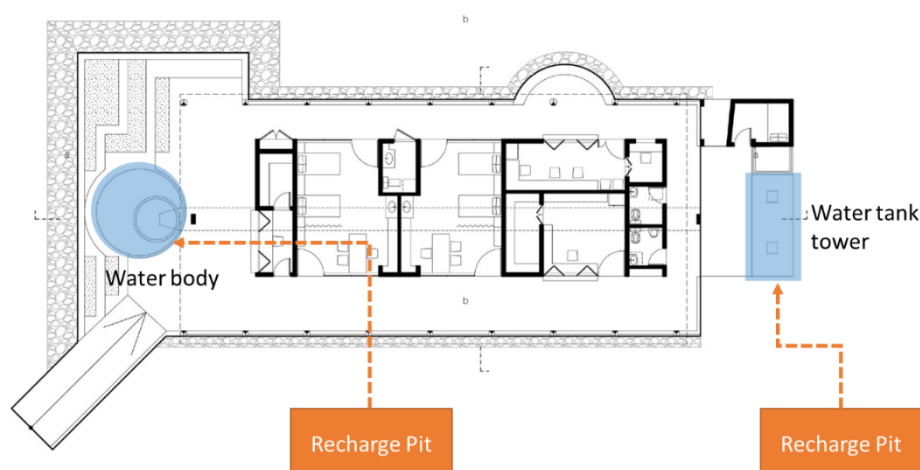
Ground floor plan analysis (Primary Healthcare Center, Dharmapuri, India) by author
